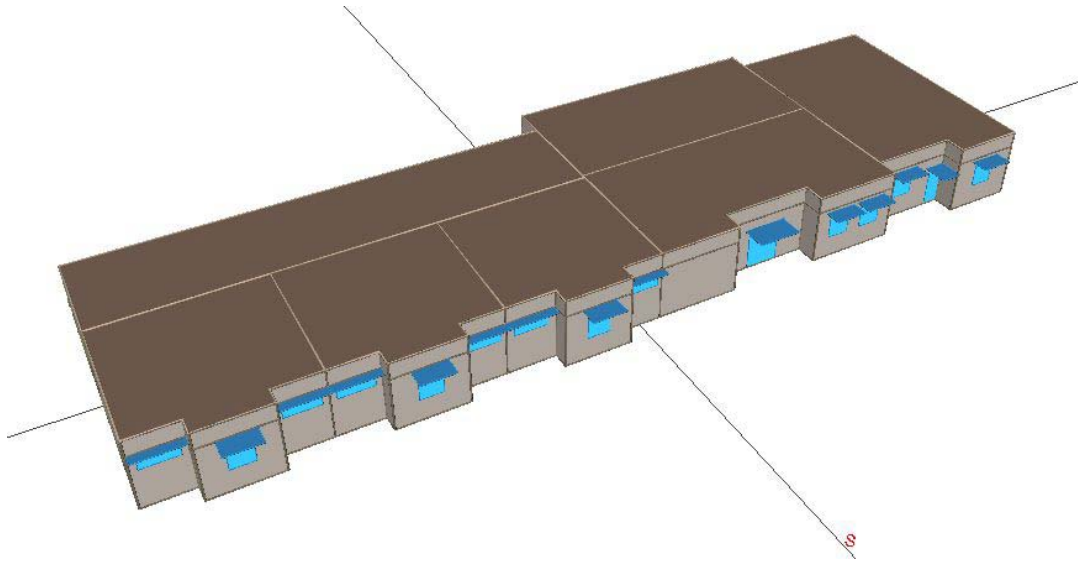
Proposed model with the addition of window overhangs on the south façade.
